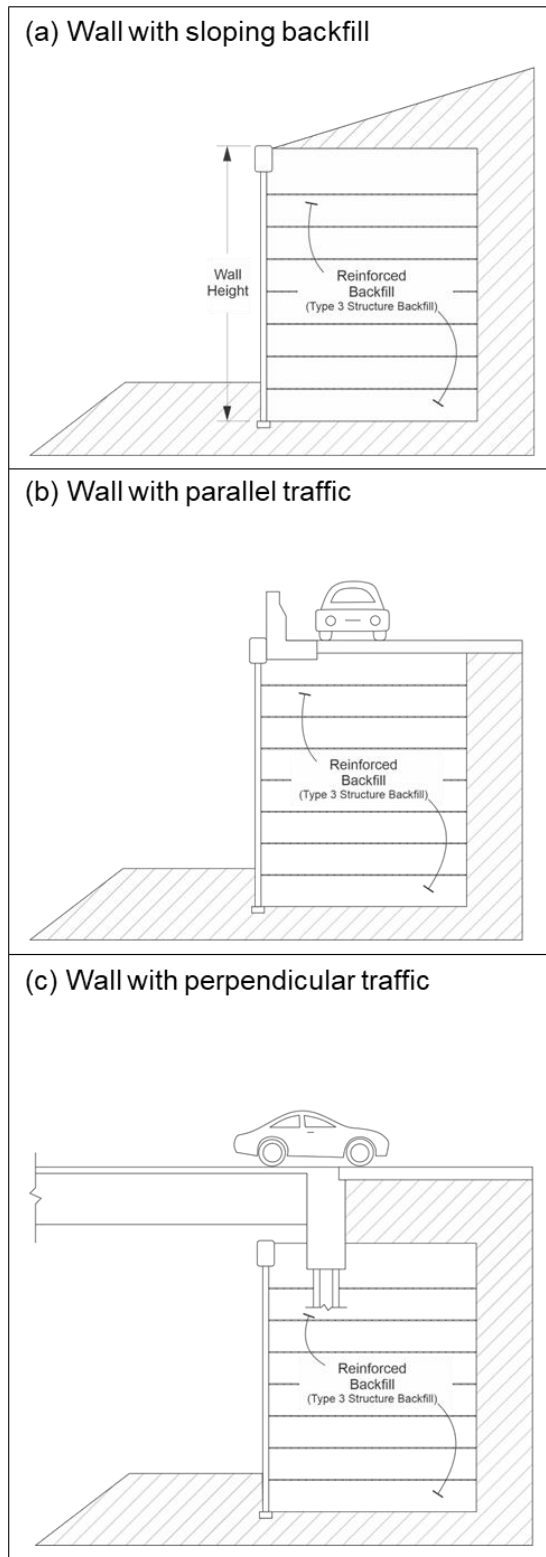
MSE wall configurations with externally applied vertical loadings: (a) sloping backfill, (b) parallel traffic, and (c) perpendicular traffic
